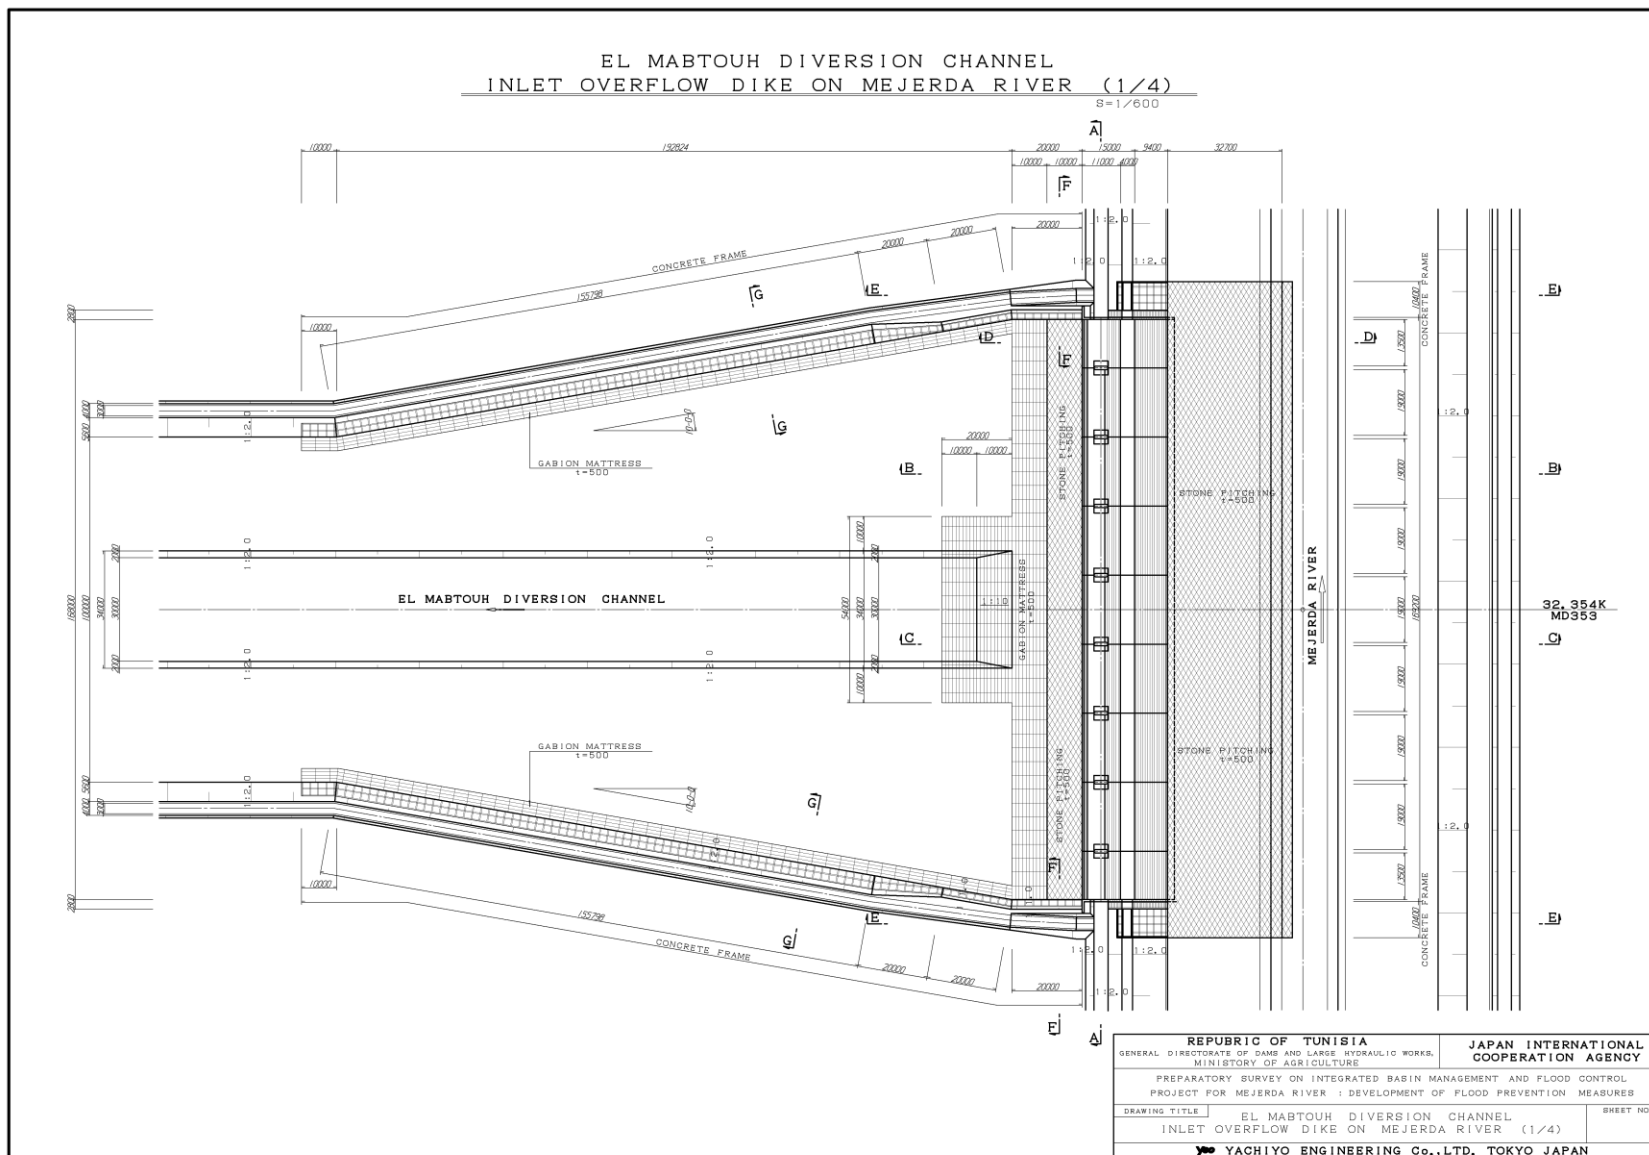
Typical Plan for Fixed Inlet Overflow Weir
